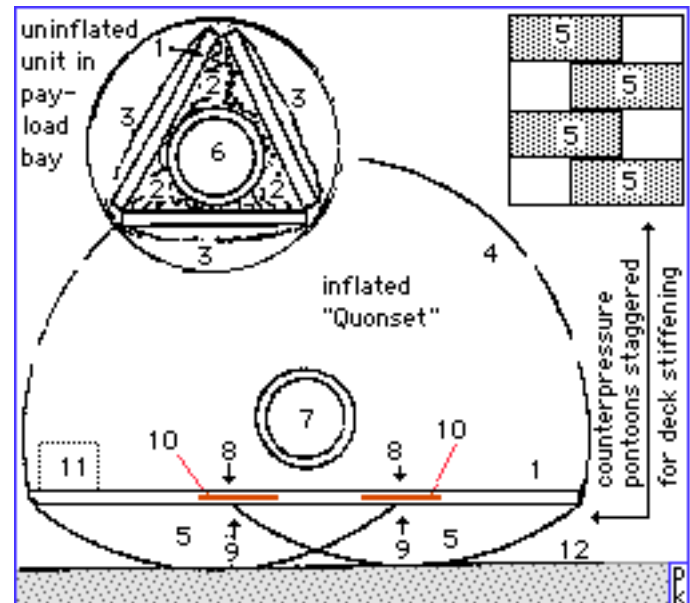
The Quonset: [1] Inflatable sidewalls and end walls.. [2] Inflatable mid-section [3] Docking tunnel [4] Triple slab hinged floor [5] Counterpressure pontoons staggered for deck stiffening [6] Contingency support poles & utility chases [7] Representative floor pop-up feature [8] Representative ceiling pull-down feature [9] (Curvature of inflation extended) [10] Soil overburden for shielding [11] Original graded & compacted ground contour [12] Pull-down pleated room divider
